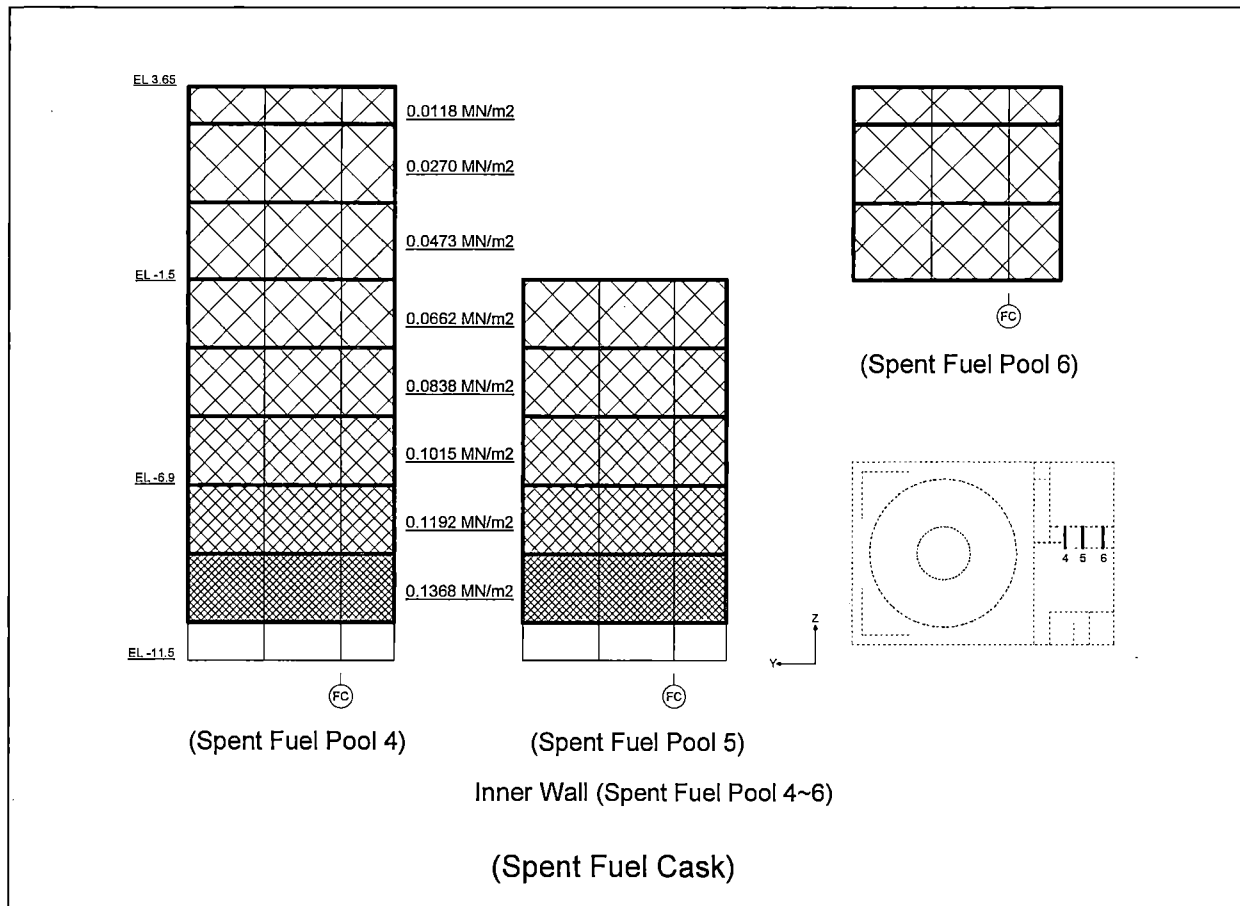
Hydrostatic Loads on the Inner Wall at EL -11,500 (4)
